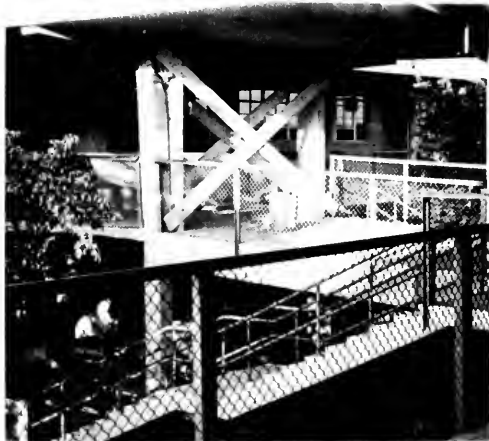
Patrick Henry Junior High School. Two-story arcade between classroom wings. Temporary wood bracing was added.
